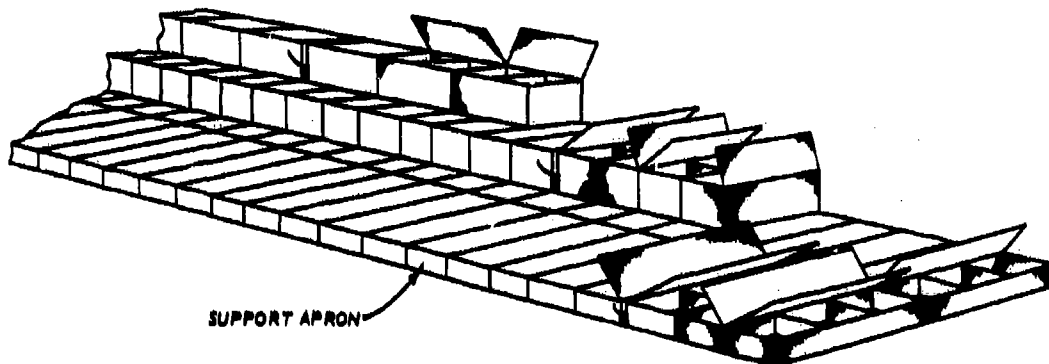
Typical arrangement of gabions used to protect a streambank (photo courtesy of Maccaferri Gabions, Inc.)
